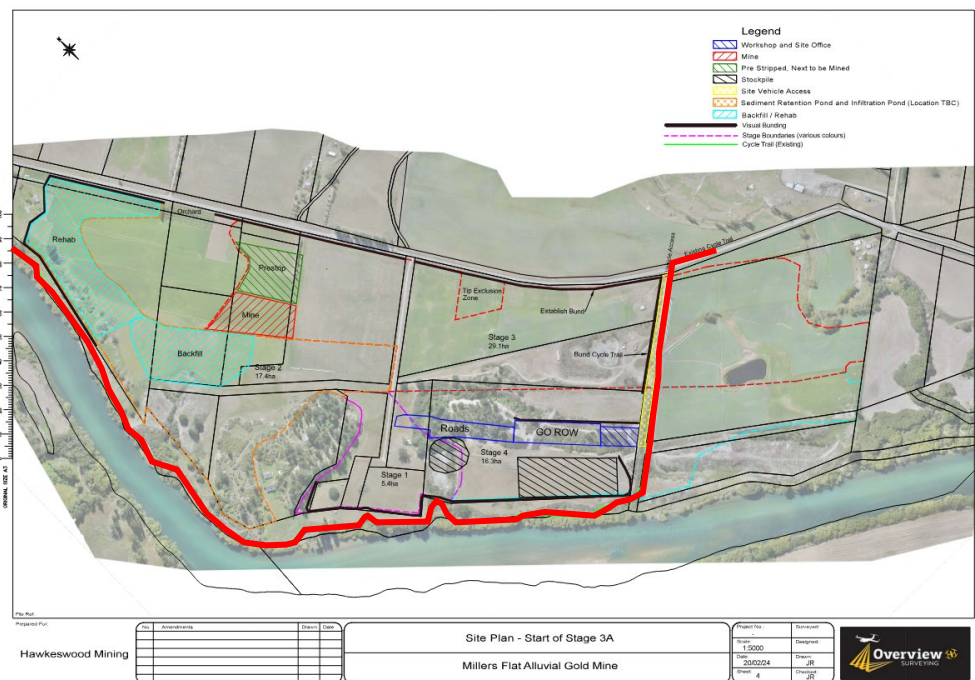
Stage 3A site plan showing existing cycle trail alignment
